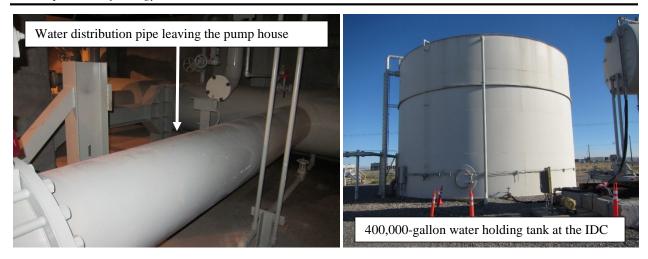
Existing Infrastructure to be used for Proposed Water Distribution System Construction activities would include the following:
